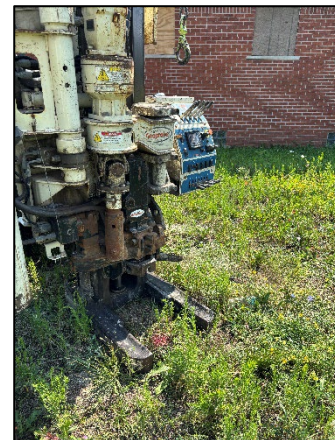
Viewing 14404 SB02 Drilling, Facing East.
